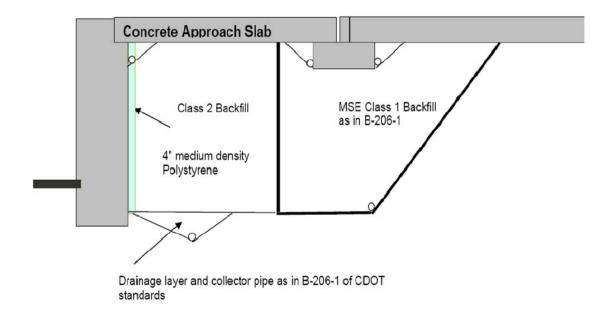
Mechanically stabilized earth (MSE) walls system under sleeper slab (Abu-Hejleh et al., 2006)
